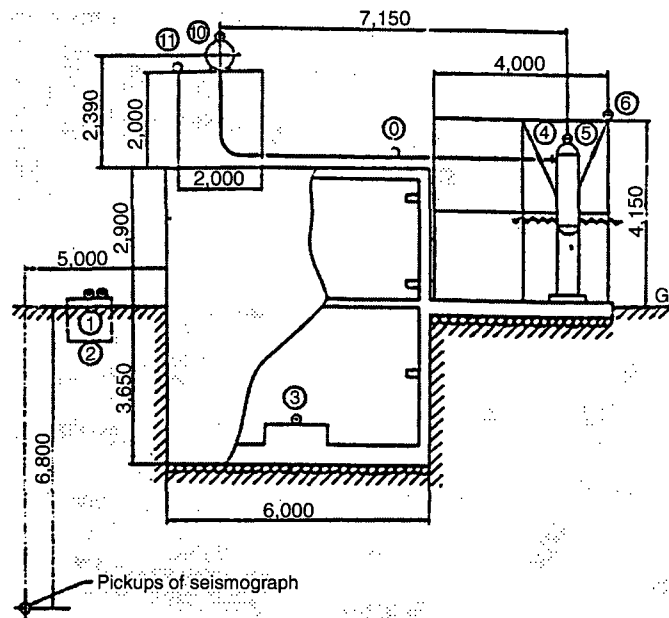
Cross section through chemical engineering plant model, Chiba Field Station.
